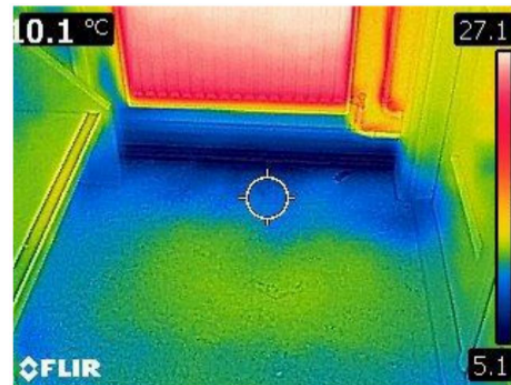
Heat loss below a radiator at the wall-floor junction on the ground floor – Image © OAMK
